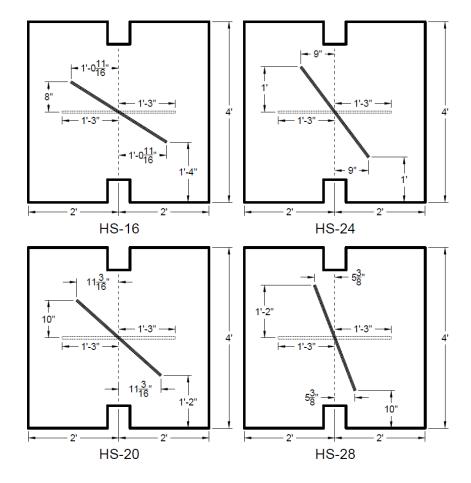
Plan Views of the Horizontal Skew Misalignment Specimens
